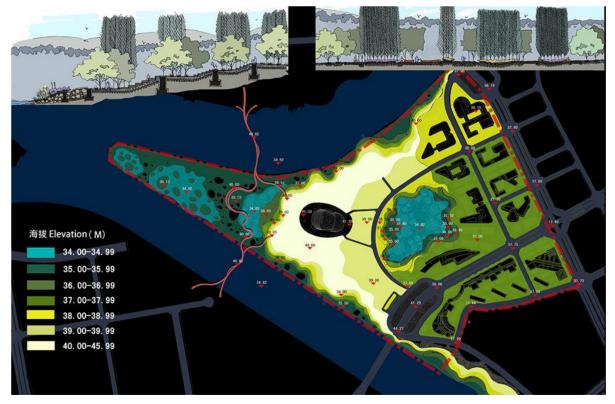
Grading Plan and Section: Flood walls are removed and a cut and fill strategy is used to create terraces to make the site cooperate with flooding. The design is 100% permeable. The surfaces include gravel surfaces for pedestrians, bioswales for planting, and permeable concrete for automobile use.
